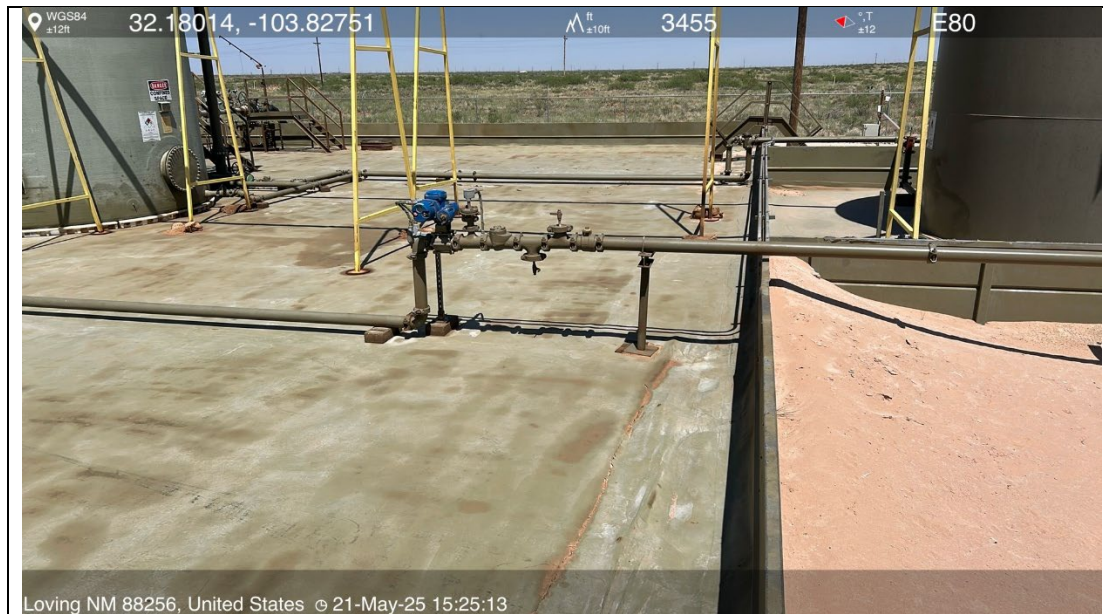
/21/2025	Direction Facing	east	Photo 4
